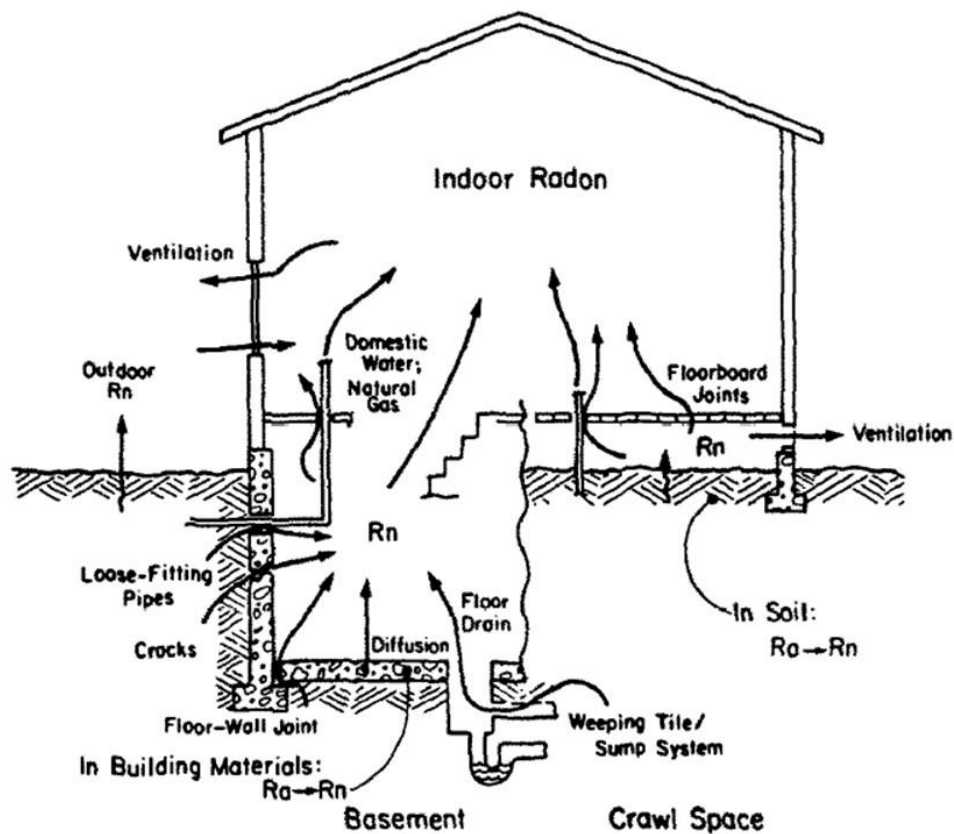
Potential sources and entry pathways of radon for a typical house (From: Sextro, 1987).
